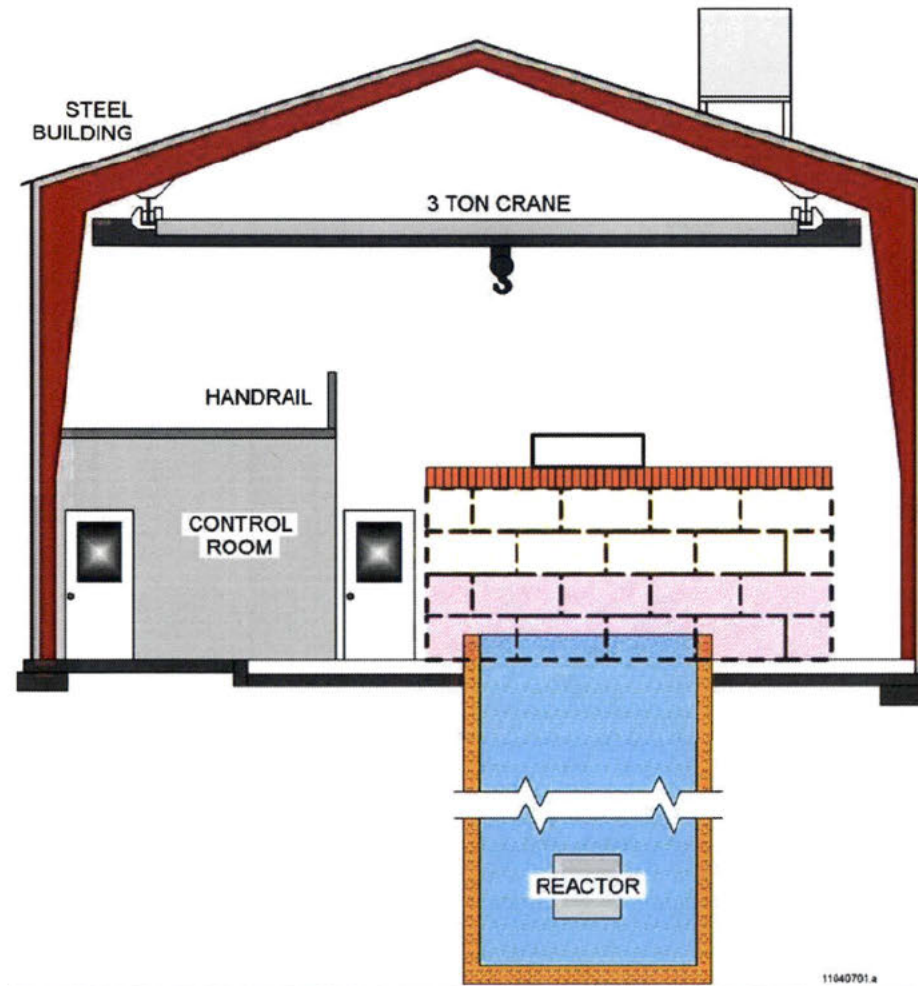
Cross Section of ARRR High Bay Reactor Building
